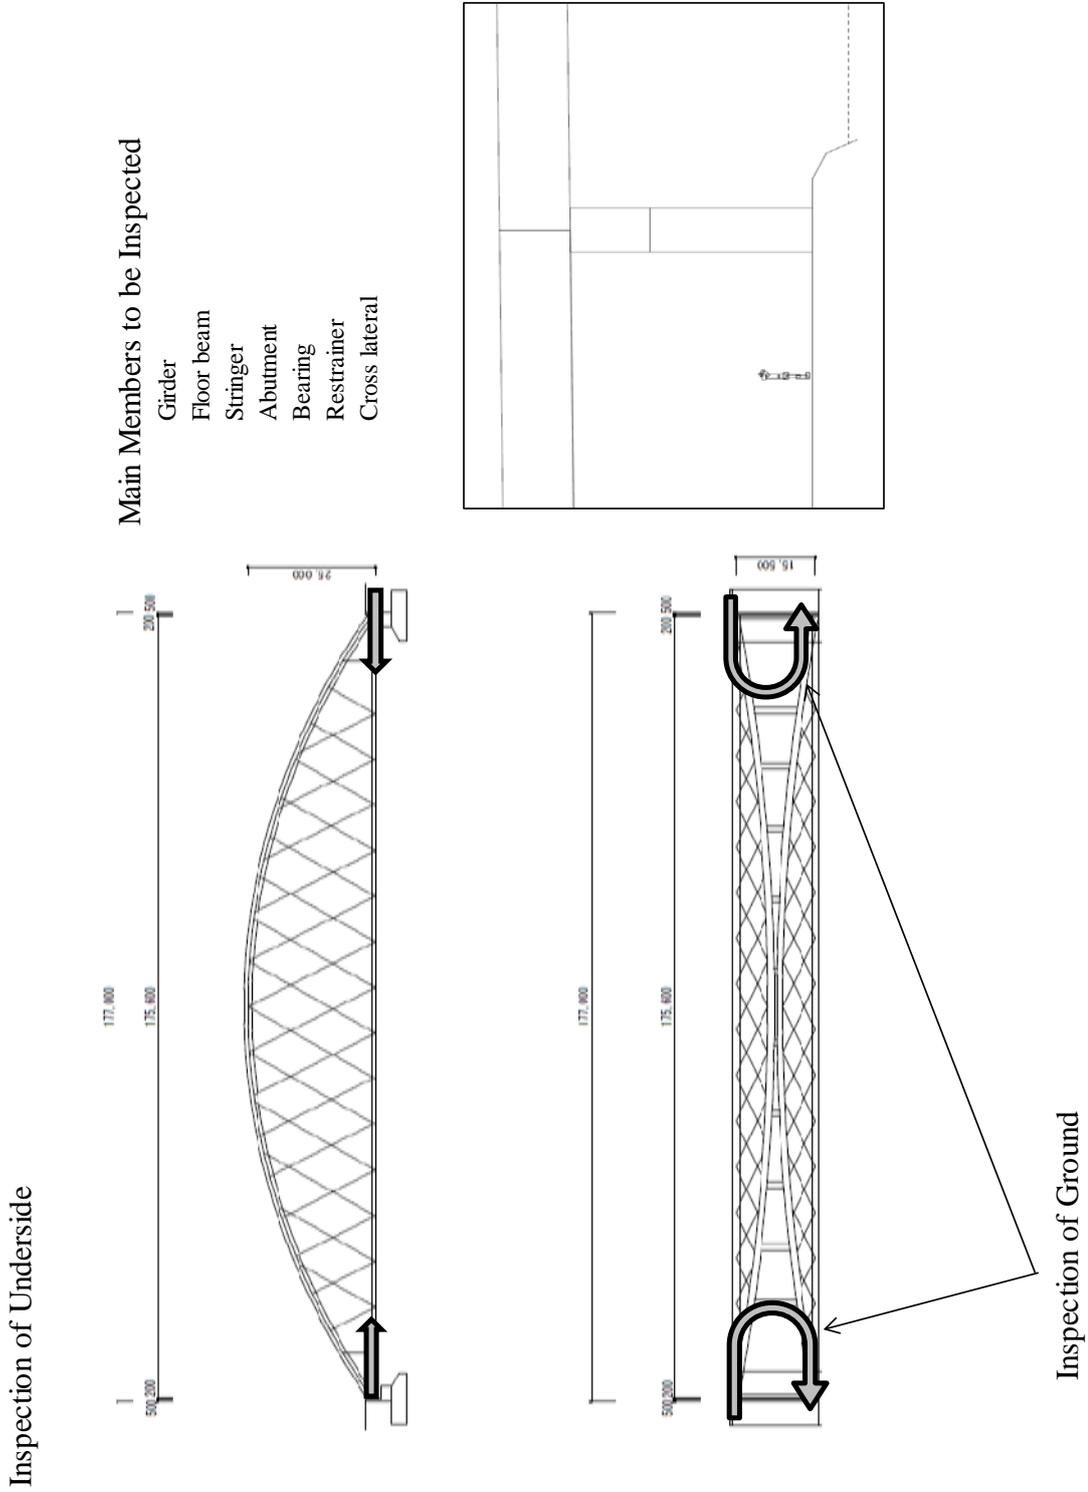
Check Points of Condition Inspection (1 of 4)
